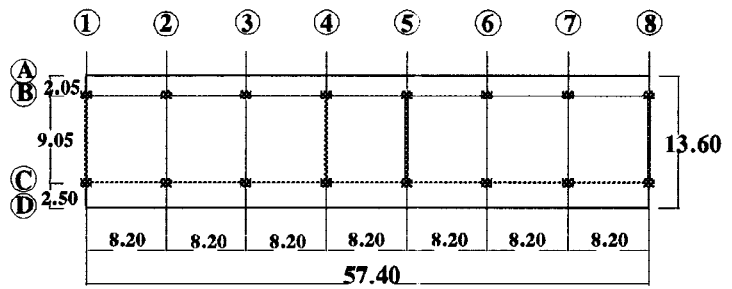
Plan view for hotel H2 (dimensions in m.)
